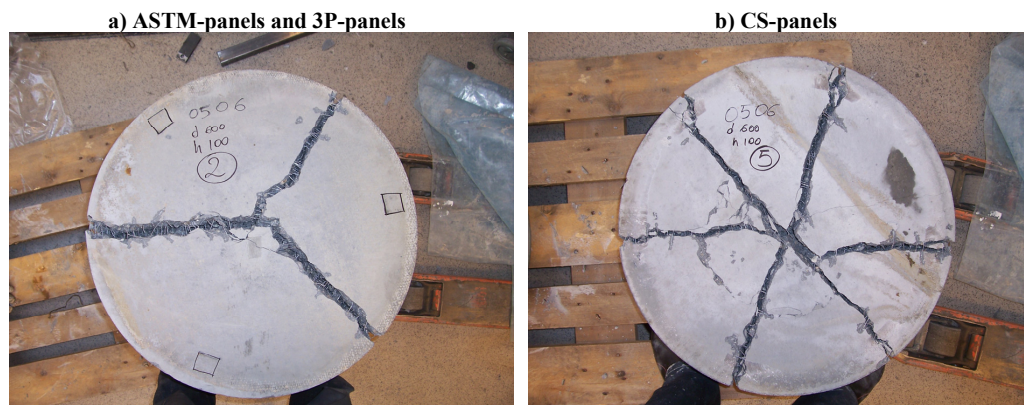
Typical crack pattern, panels reinforced with 0.5 vol% steel fibres
